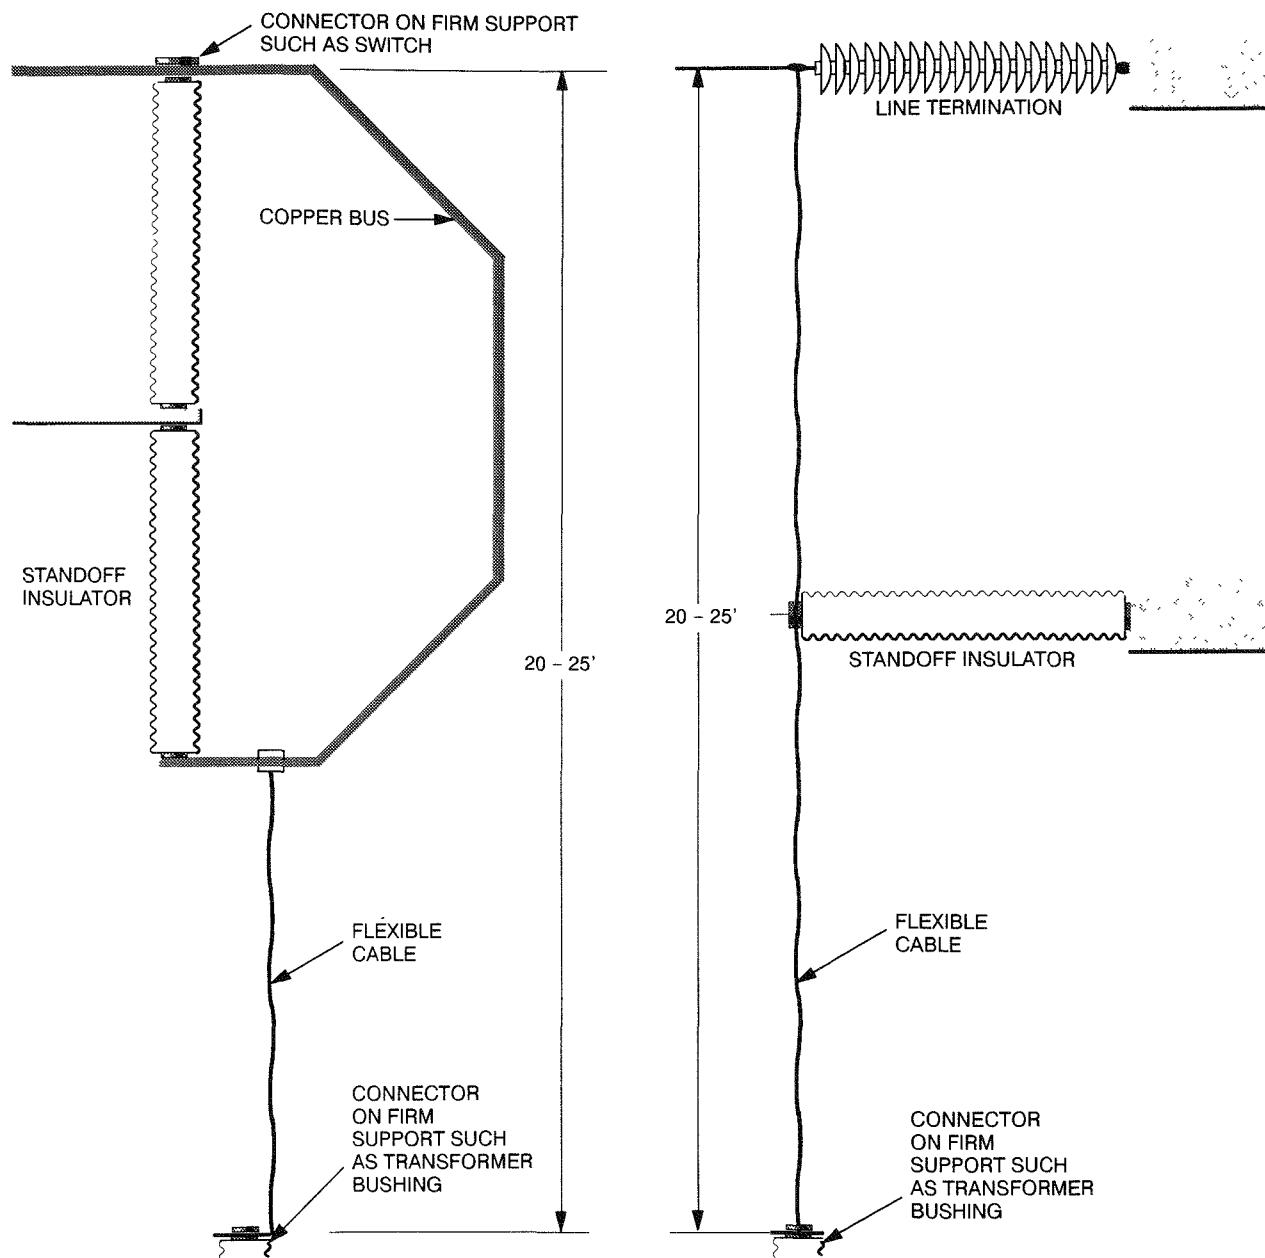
Examples of Switchyard Connection Arrangements Where Standoff Insulators Failed
